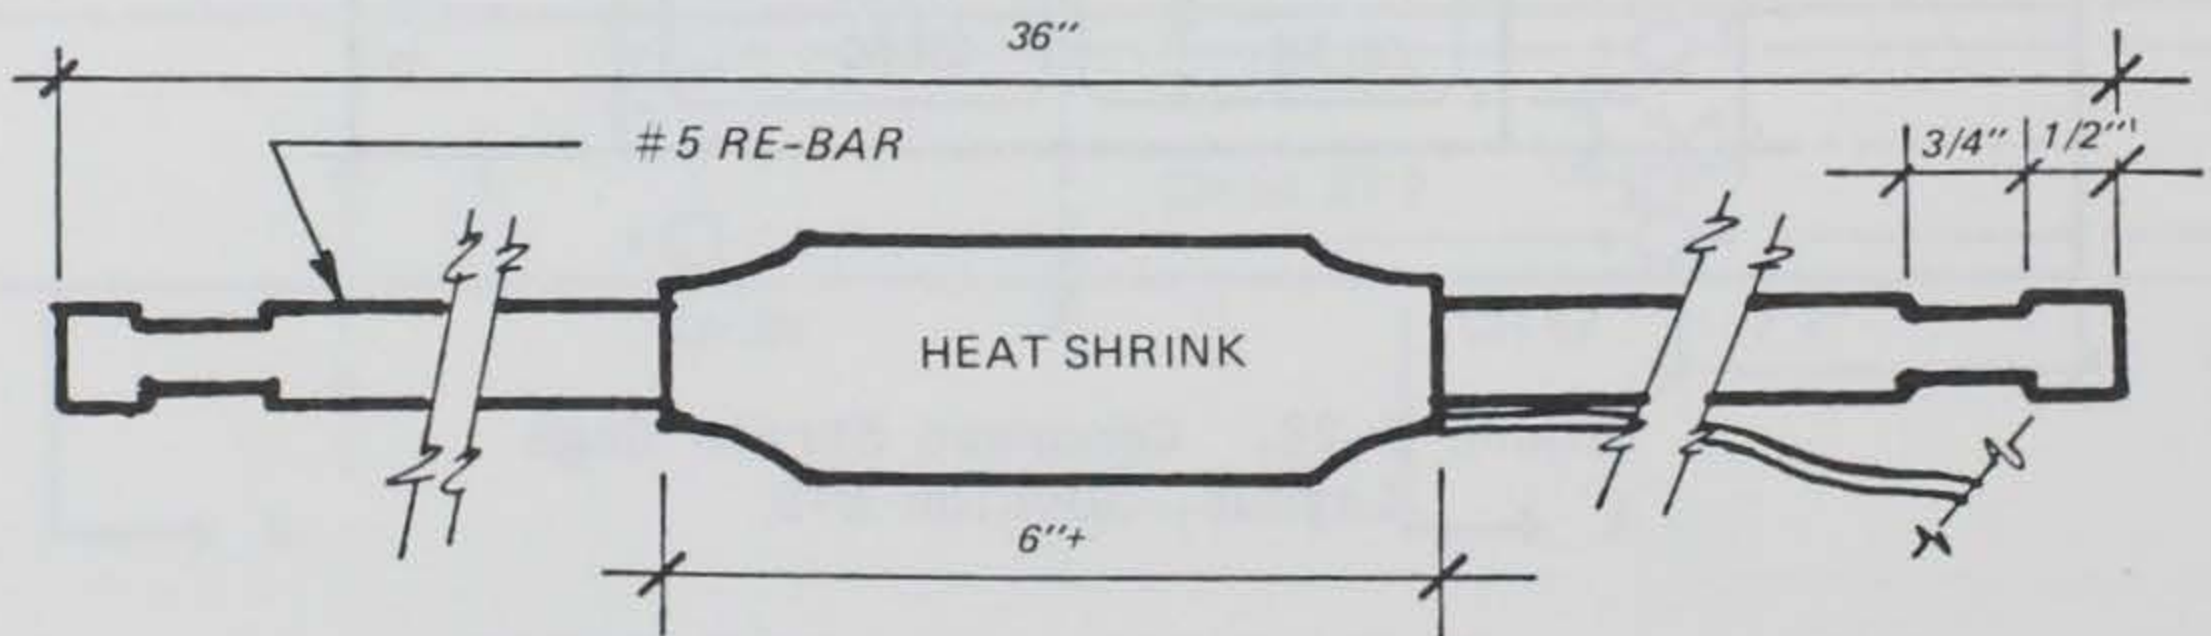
Concrete Strain Gage Layout, Section B-B
